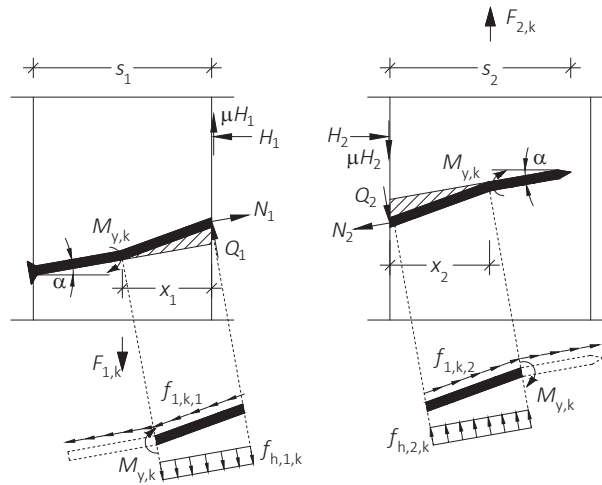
Equilibrium of forces for a timber-to-timber joint with fully threaded screws inserted at an angle α and for the failure mechanism with two plastic hinges per shear plane.
